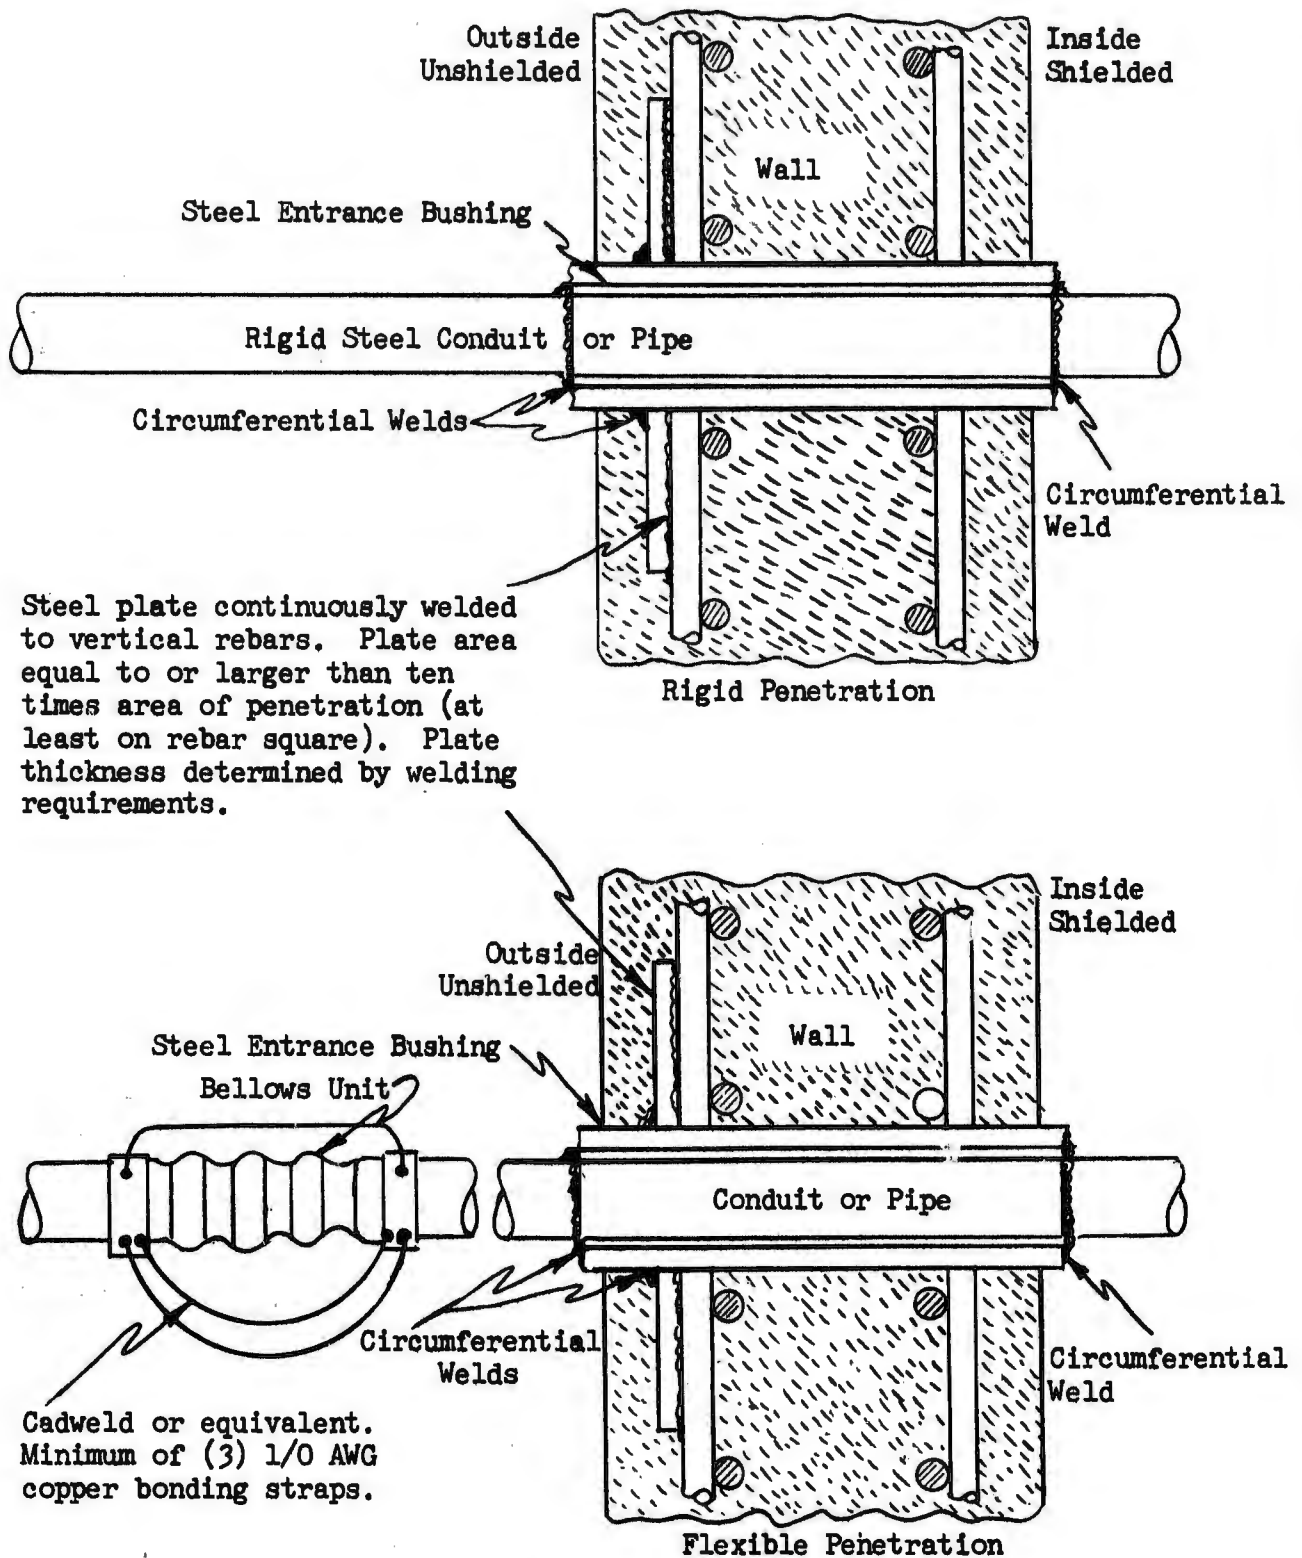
Outside Wall Penetrations with Double-Course Rebar Construction
